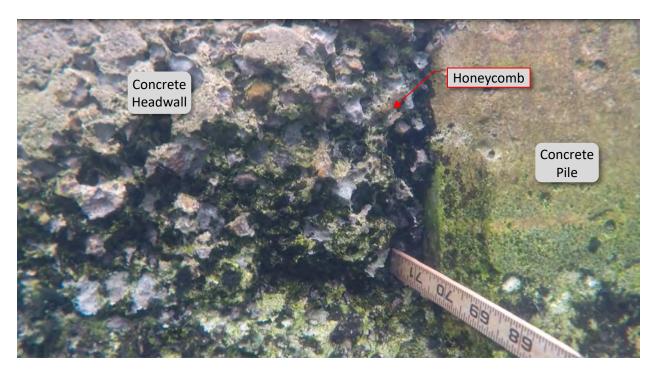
HW1. STA 2+49 - 2+50. Honeycomb depth at culvert headwall.
